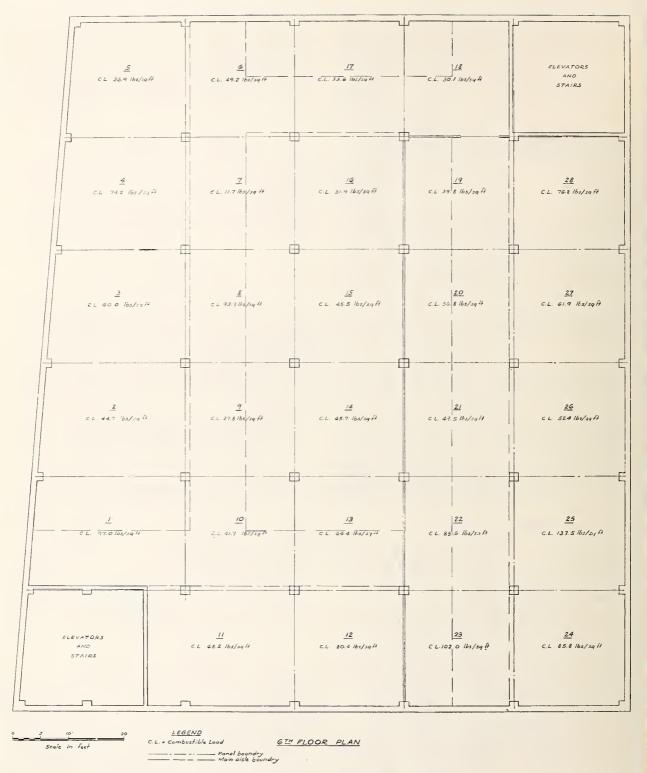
Sixth-floor plan, warehouse, New York, N. Y.
